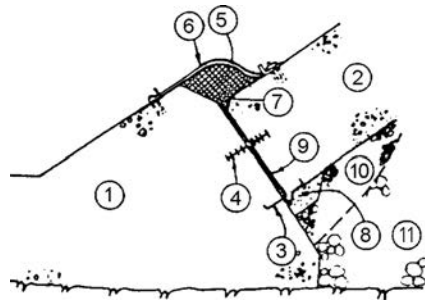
The perimeter joint at Foz do Areia dam, Brazil (after Pinto & Mori, 1988). (1) Concrete plinth; (2) facing slab; (3) copper waterstop; (4) PVC waterstop; (5) mastic; (6) PVC cover; (7) neoprene tube  $\varnothing$  50 mm; (8) sand asphalt; (9) timber sawdust; (10) stone chippings; (11) rockfill.
